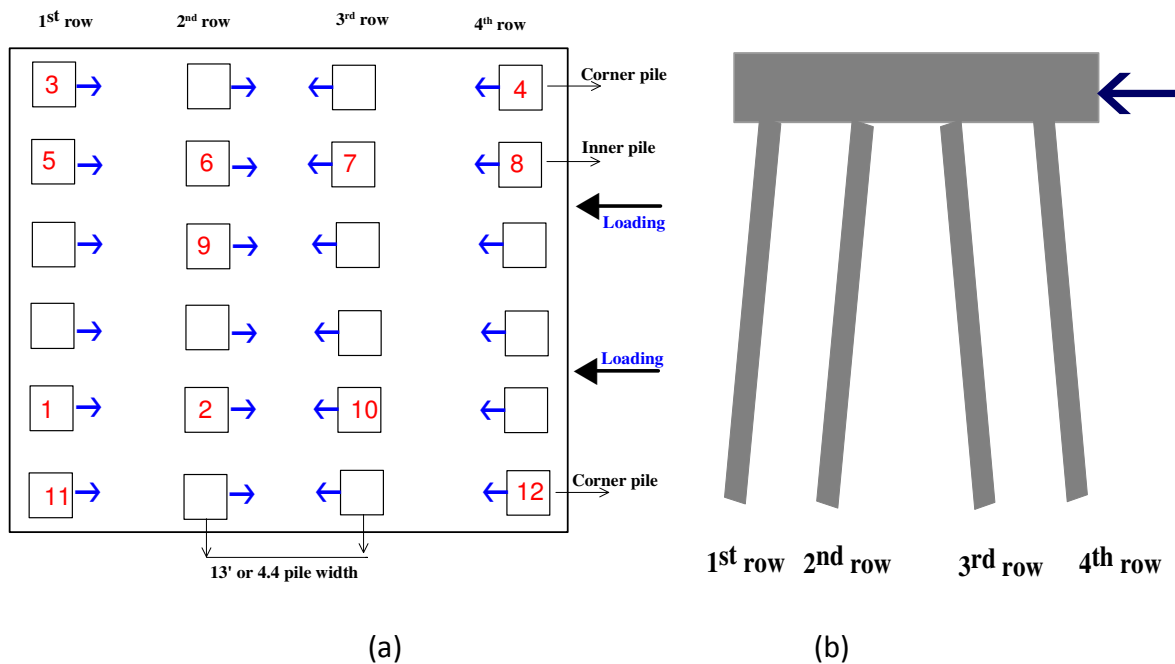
a) Plan view of pile layout    b) Side view of pile layout
